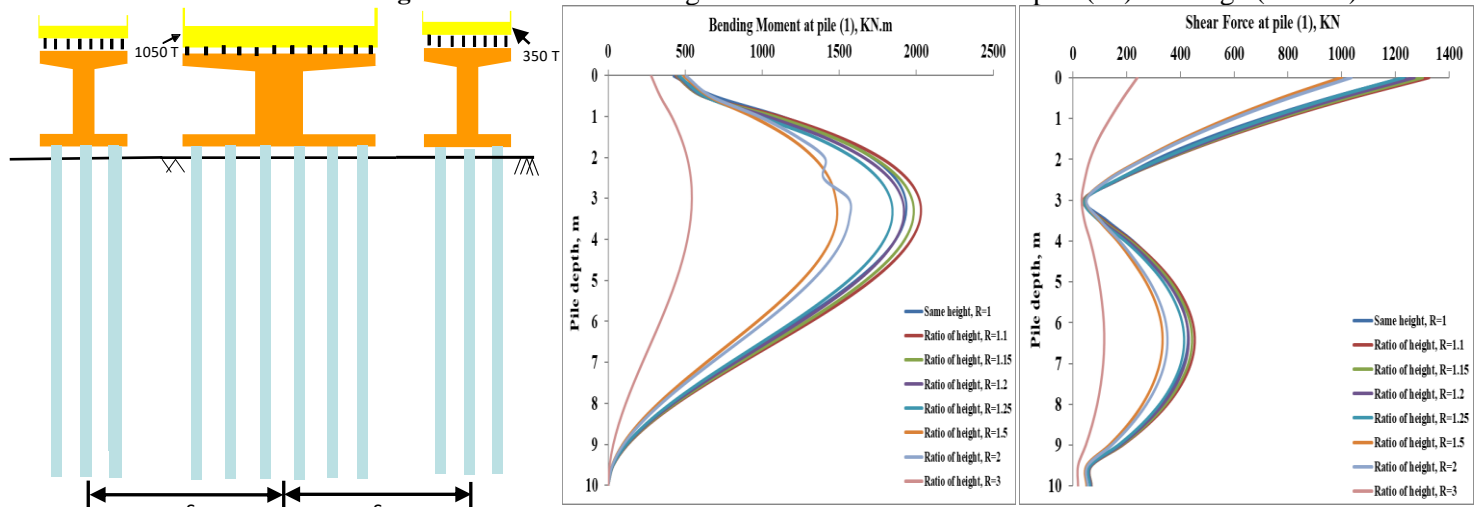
Three dissimilar bridges: Internal forces at corner pile (7) of bridge (1050 T)
